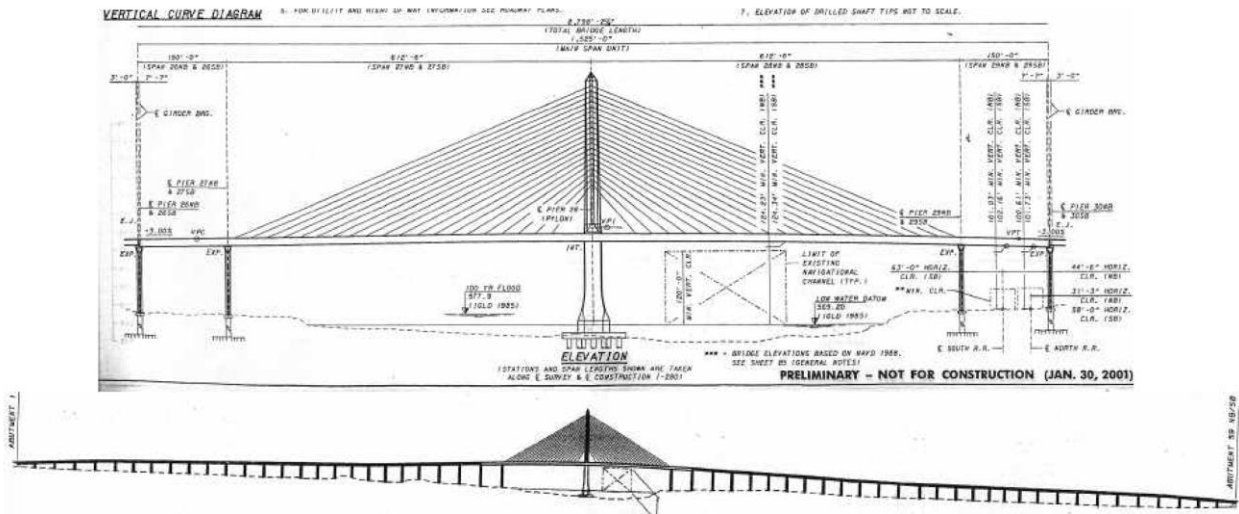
Plan and Elevation Views of MRC/VGCS (Nims, 2002)
